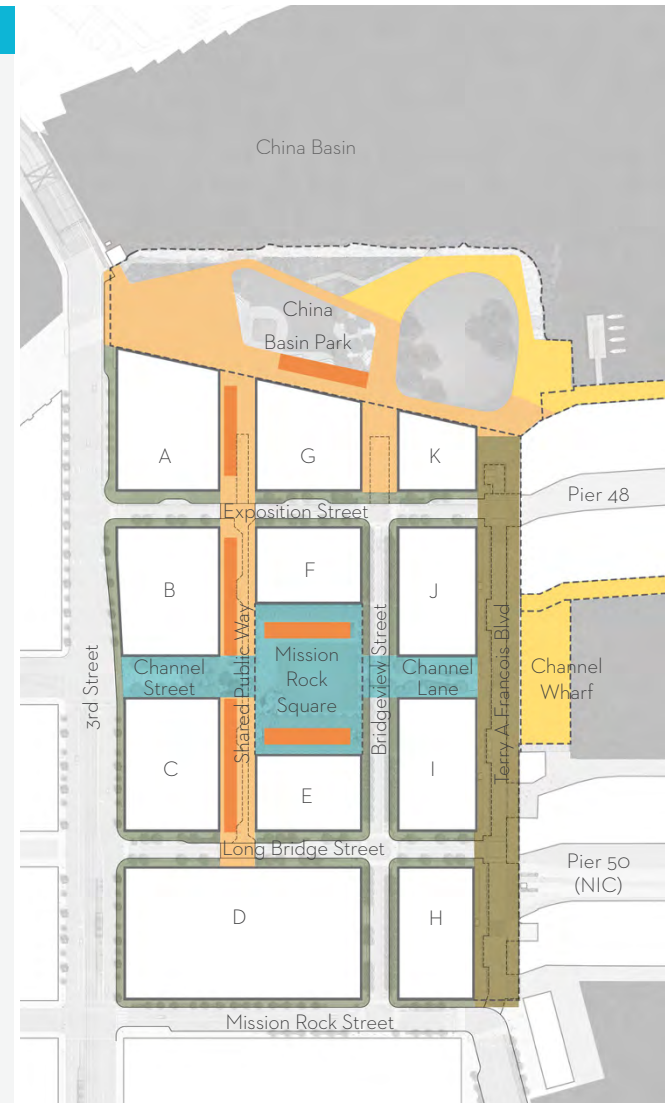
Conceptual Paving Zones diagram illustrating the relationships among paving zones defined in Guideline 2.6.4. Paving details and conformance with City standards are defined in the Infrastructure Plan.
